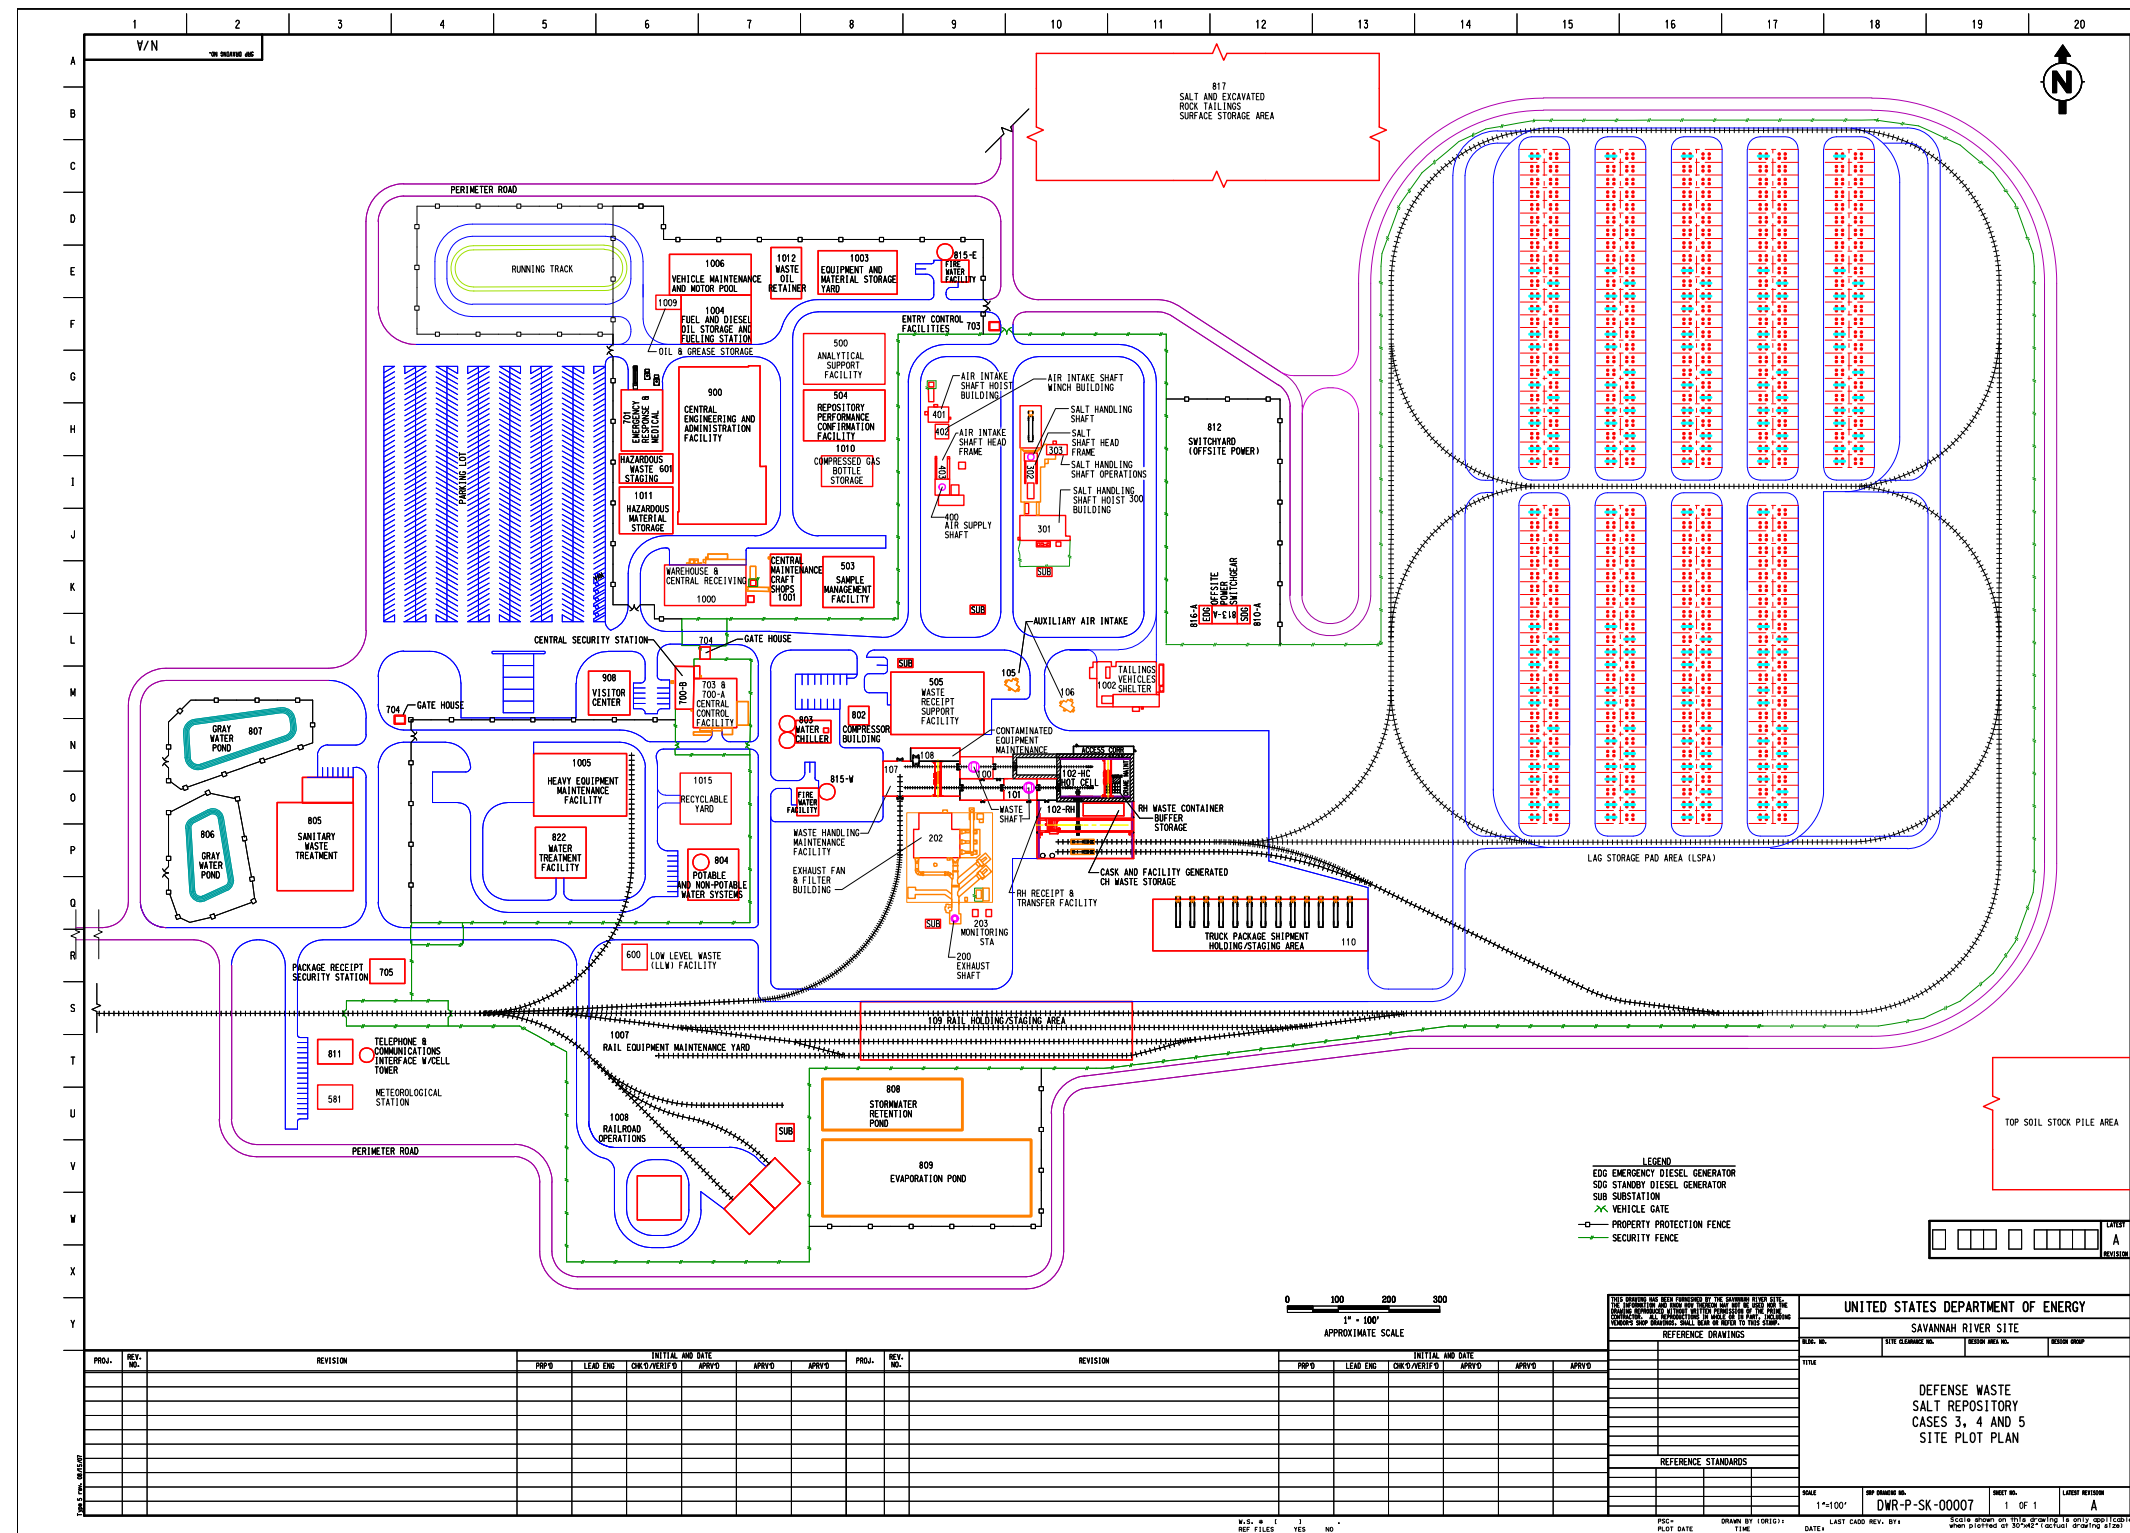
Cases 3, 4, 5 WRTF Surface Facilities Site Plot Plan
